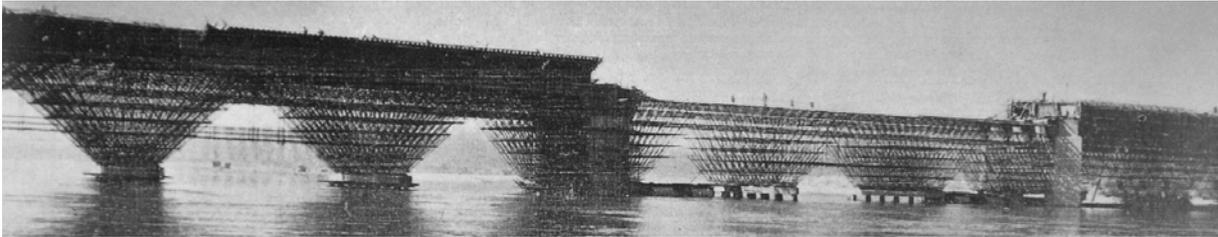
Falsework built for the entire length of the bridge to construct the Po Bridge for the Autostrade del Sol, Italy. (Wittfoht)
